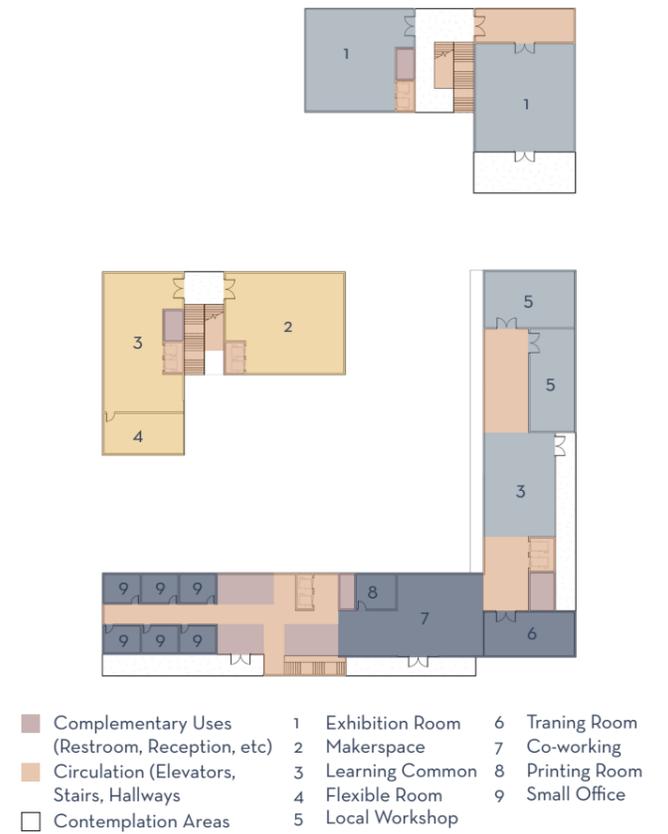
Second Floor Plan Uses. | Source: Author's elaboration
